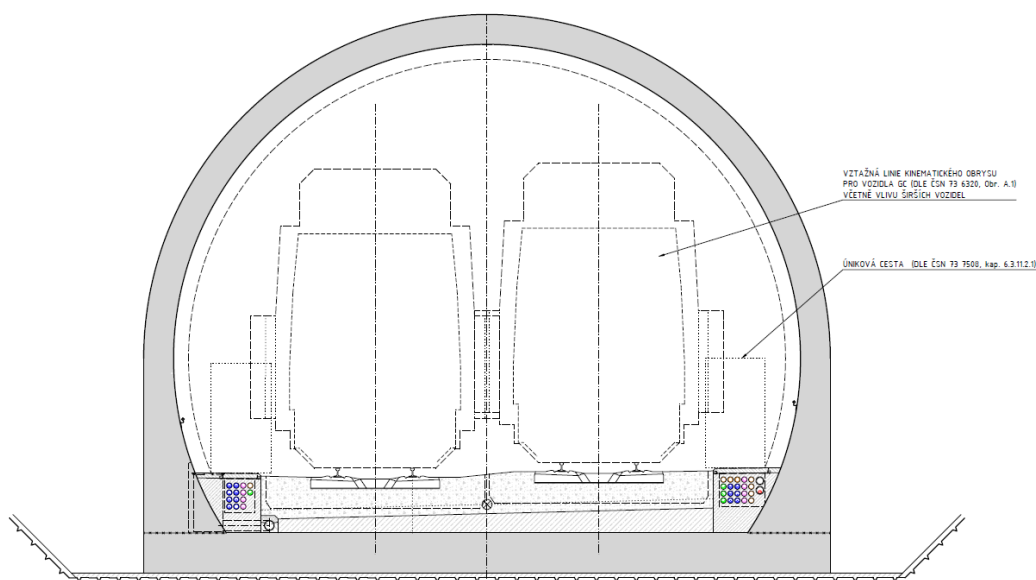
Cross-section of the Ledčice Tunnel (Sagasta s.r.o.)
